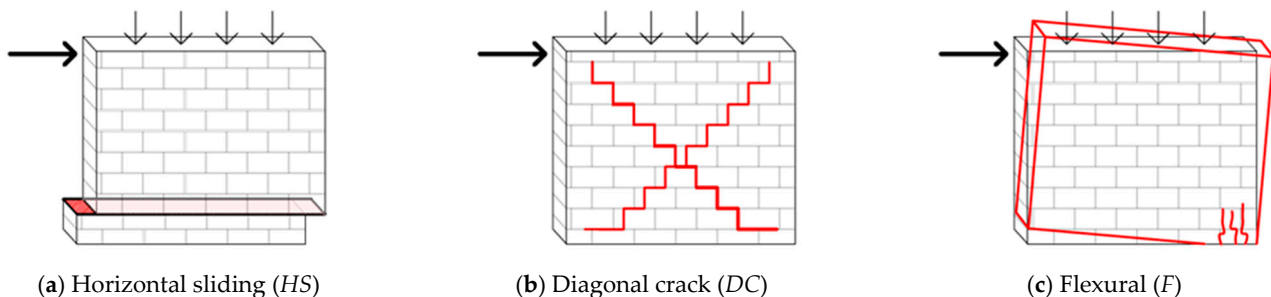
Sketch of the failure mechanisms of a masonry wall (adapted from [6]).
